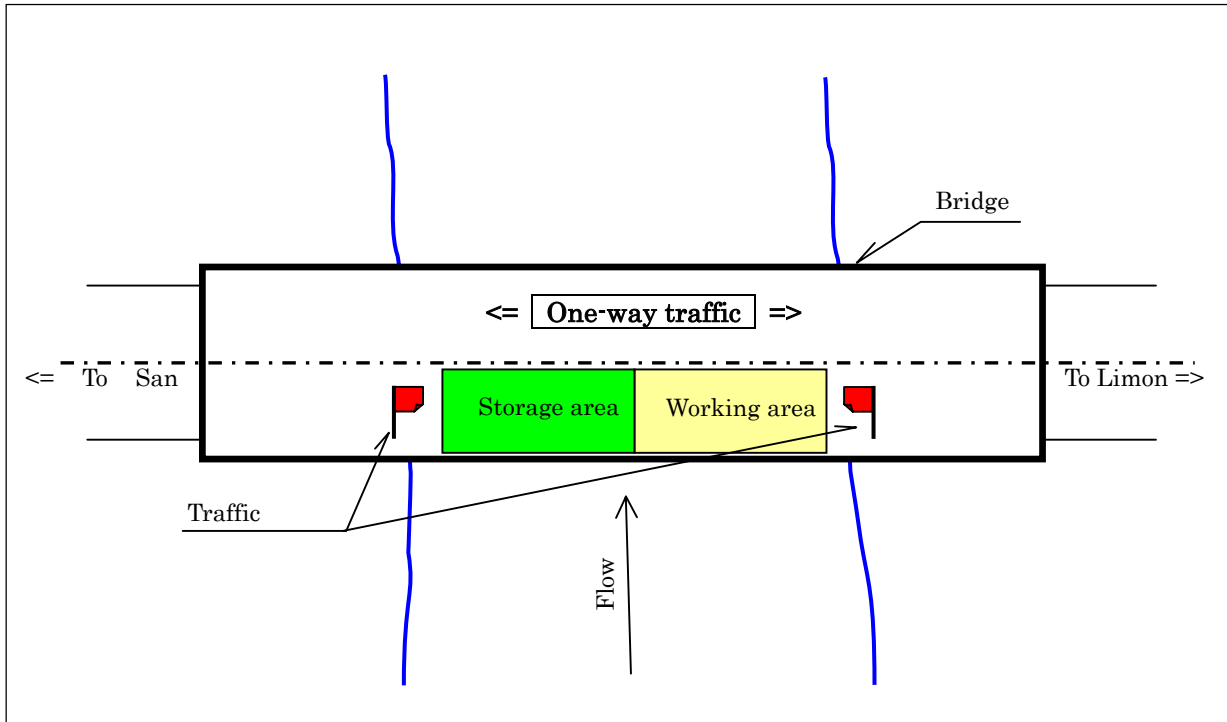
Model Layout of Storage Area on No. 20 Bridge (Rio Sucio)
